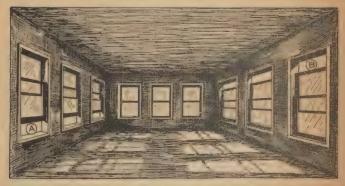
Ventilation of squad rooms showing method of arranging window openings. A—Inlet. B—Outlet
